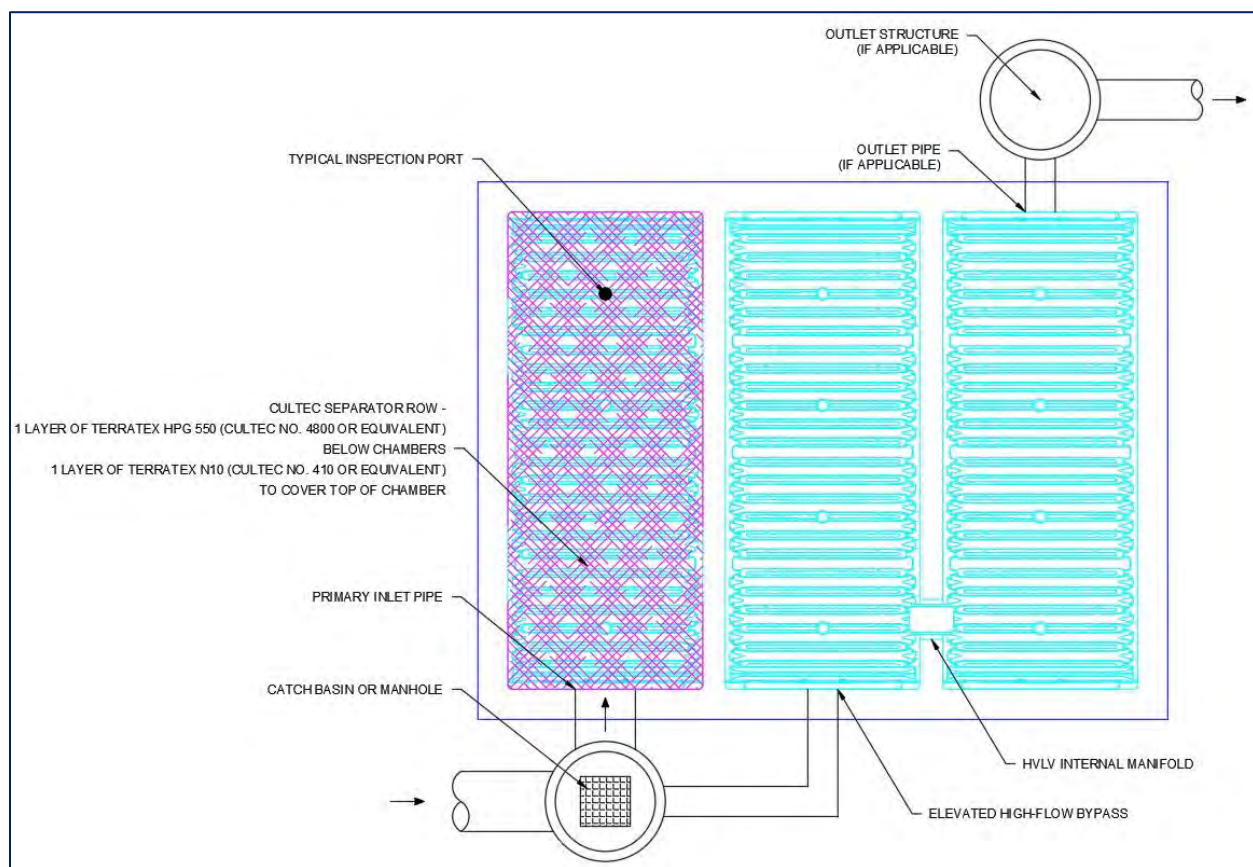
Cultec Separator™ Row Filtration System – Plan View
